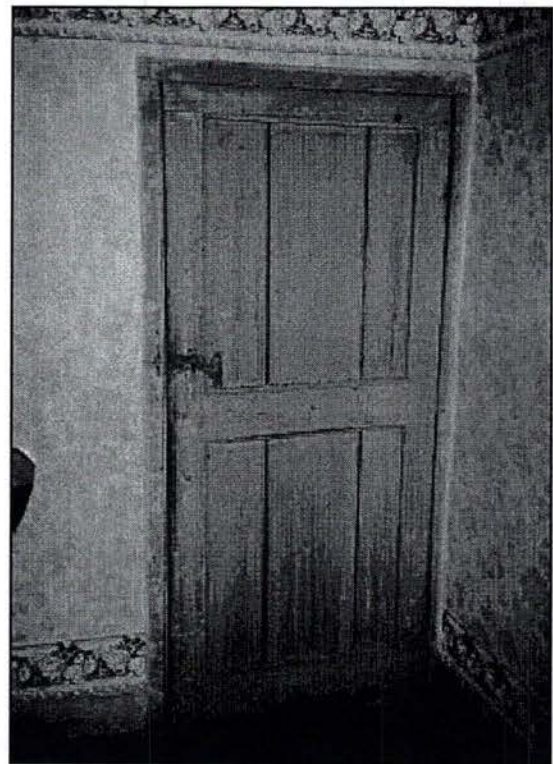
Recycled, hand planed, board and batton door to Room 208 (closed).
